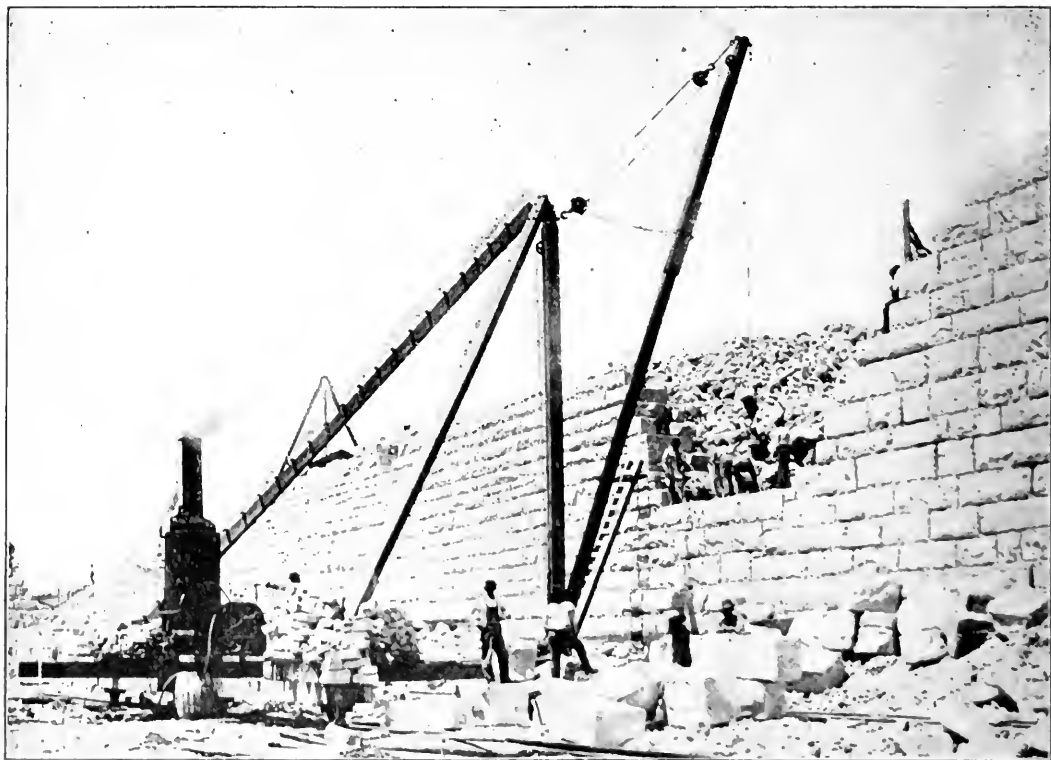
TYPICAL WALL DERRICK USED DURING 1895.
